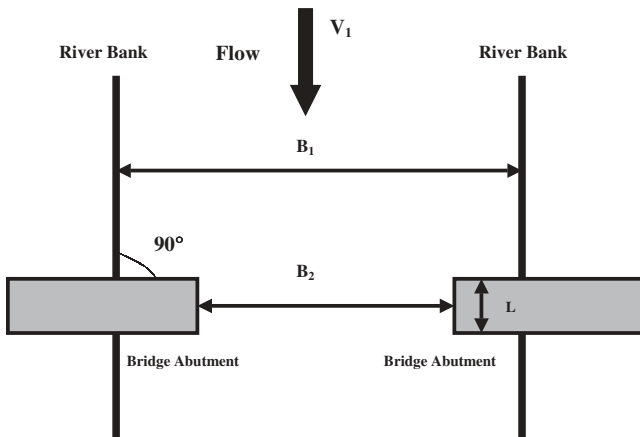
Plan view of contracted channel scour case (Example 4).
